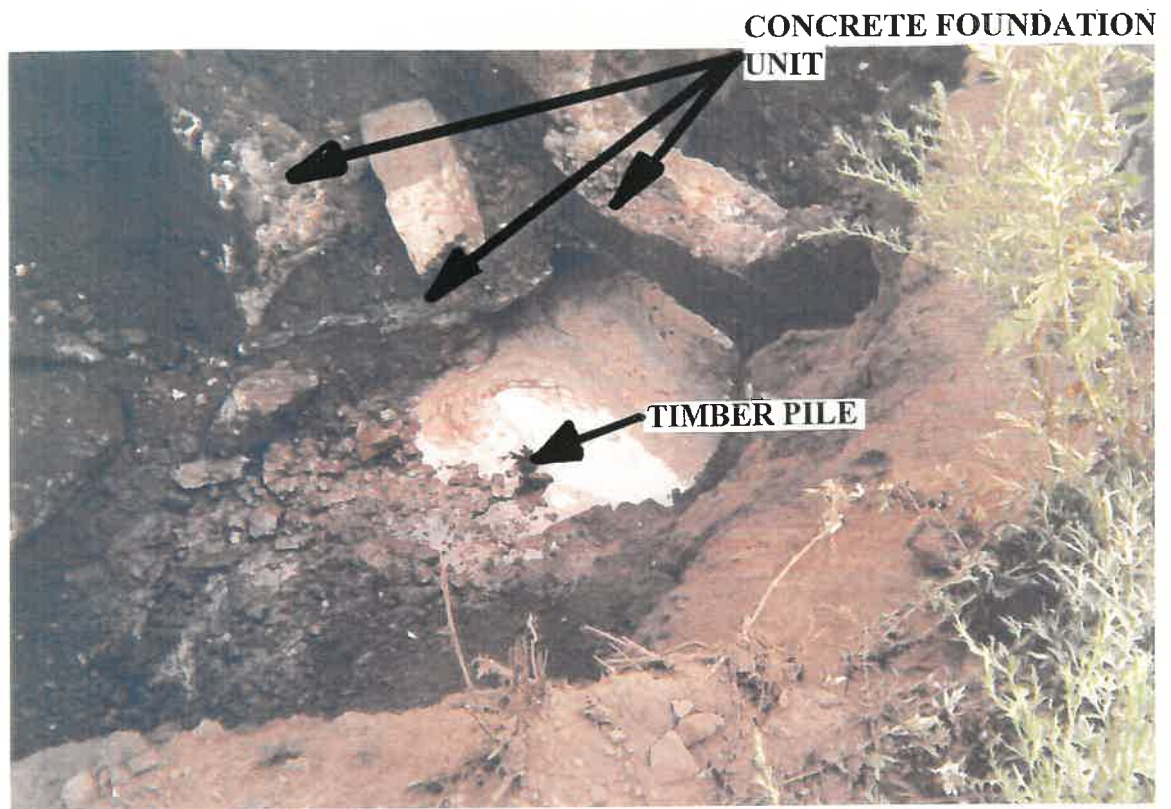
View of test trench #1 (TT-1) standing approximately 60' east of boring WC-10 looking east. Note the concrete foundation and timber pile.
